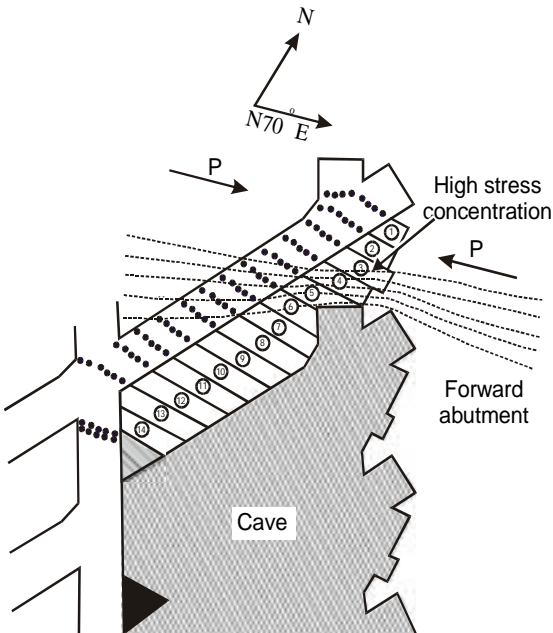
Forward horizontal stress abutment and concentration with respect to the second pillaring plan
